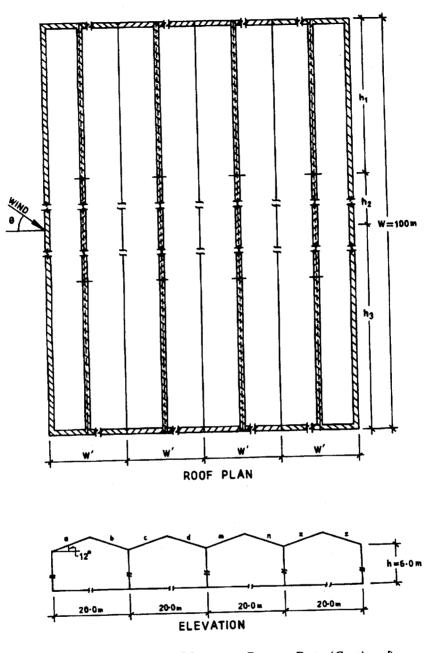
A BUILDING WITH MULTISPAN PITCHED ROOF (Continued)
